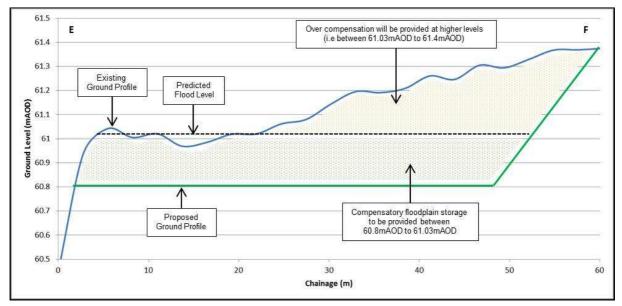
Higher Level Storage Indicative Cross Section (Set to Cross Sections Locations shown in Figure 12).
